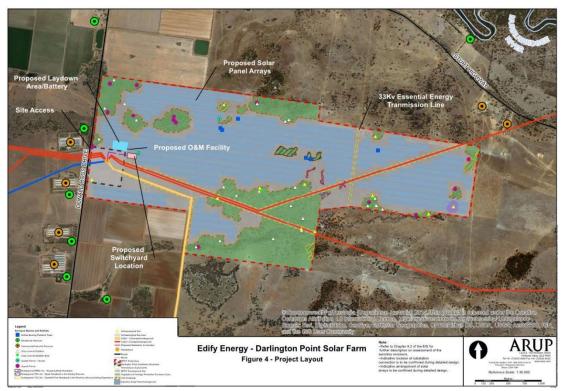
Indicative site access and layout plan (Source: Arup, DPSF EIS, 16 May 2018)
